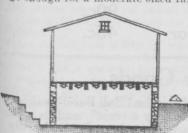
FIG. I.-ICEHOUSE AND COOL ROOM. lly, as an icehouse of that size will
